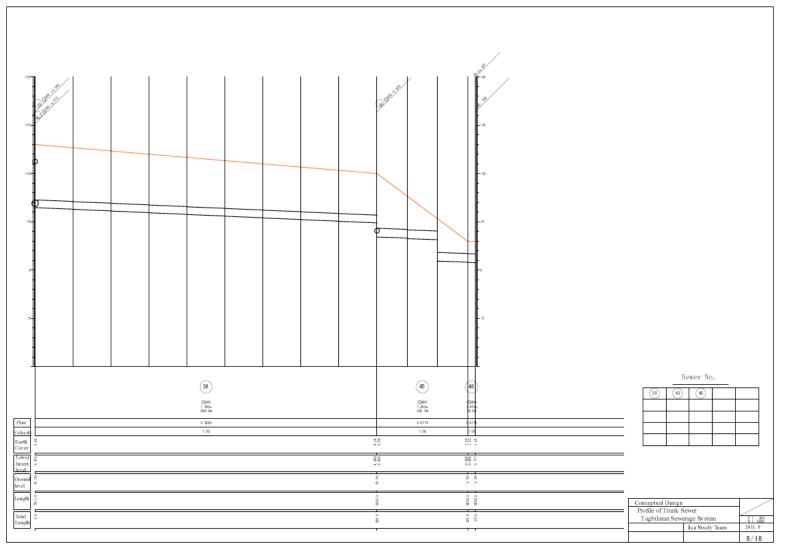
Profile of Trunk Sewer (Tagbilaran Sewerage System)
